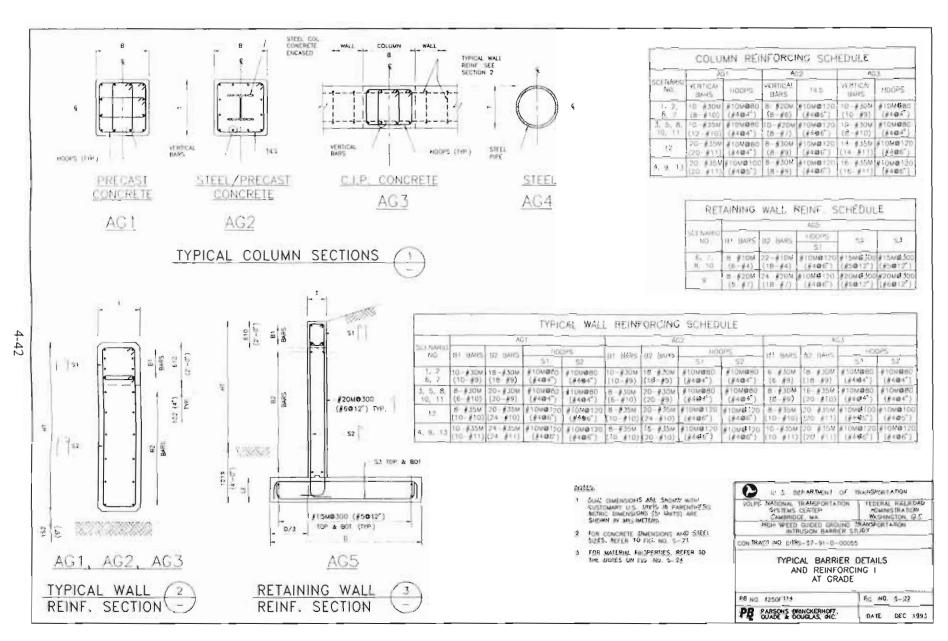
TYPICAL BARRIER DETAILS AND REINFORCING AT GRADE (I)
